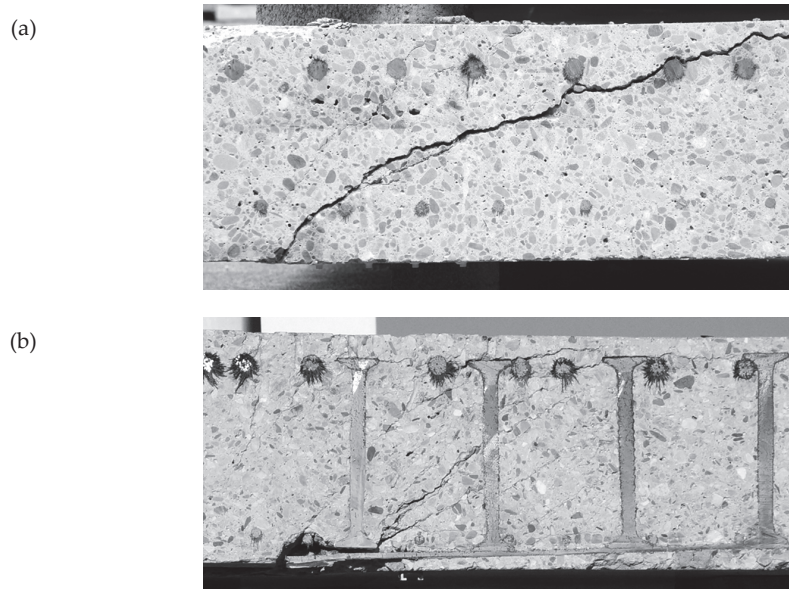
Photos of typical punching cracks on a saw-cut: (a) slab without shear reinforcement (PE7); (b) slab with shear reinforcement (PP4)
